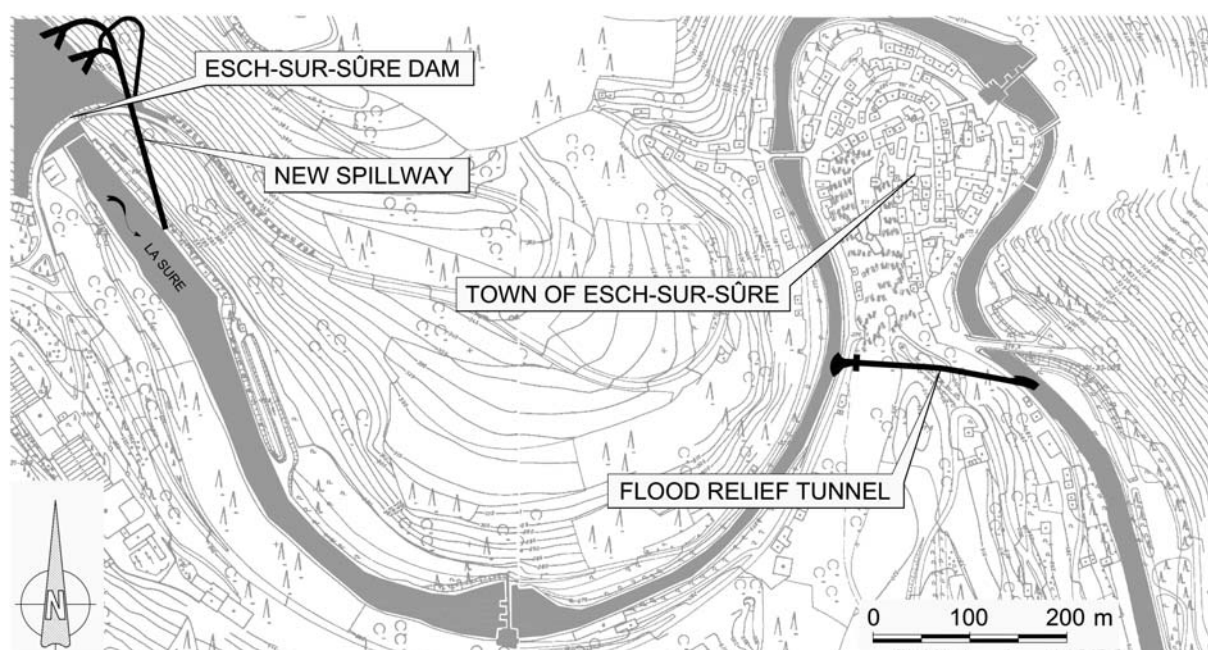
General layout of the new spillway at the Esch-sur-Sûre dam and the flood relief tunnel in the town of Esch-sur-Sûre.
